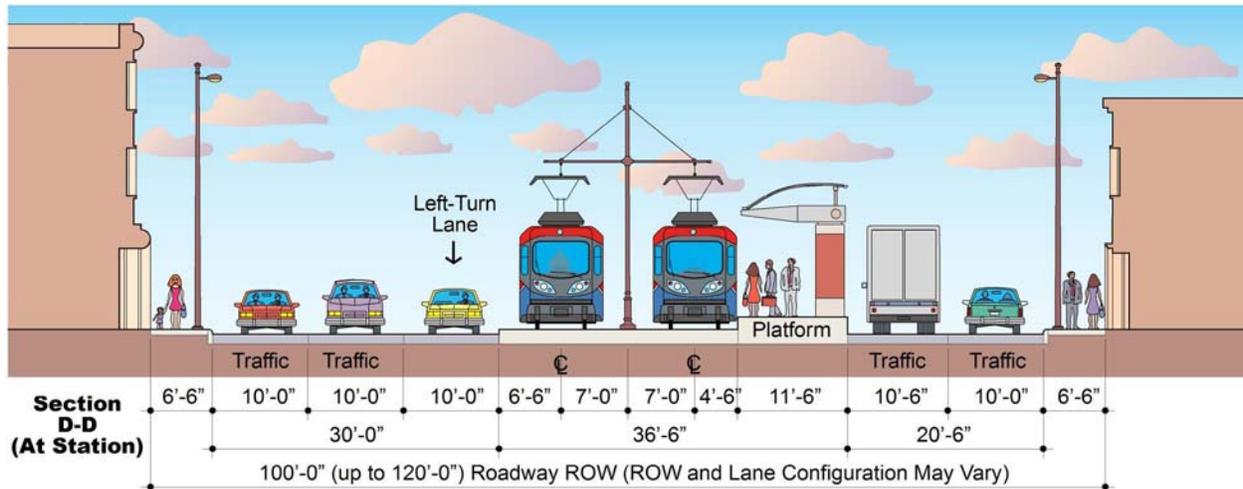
PROTOTYPE 5 – PLANS
